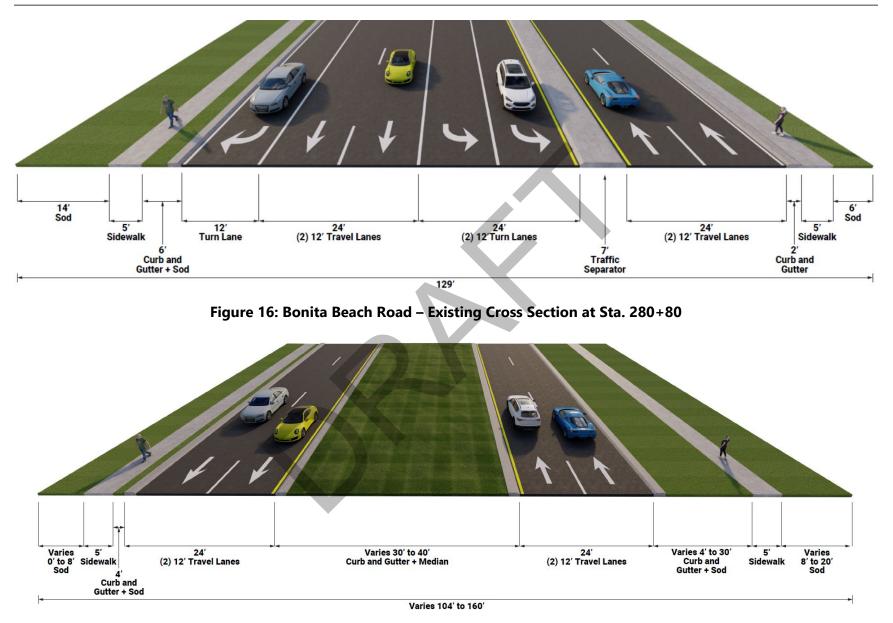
Bonita Beach Road – Existing Cross Section at Sta. 291+50
